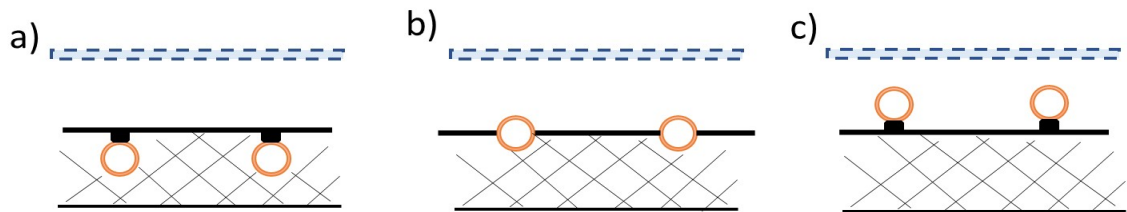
Schematic diagram of piping system fixation models: a) pipe lower bond model, b) pipe side bond model and c) pipe upper bond model.
